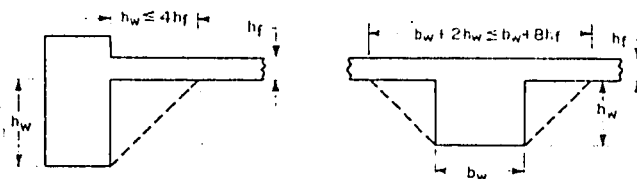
Examples of the portion of slab to be included with the beam under Section 13.1.5
